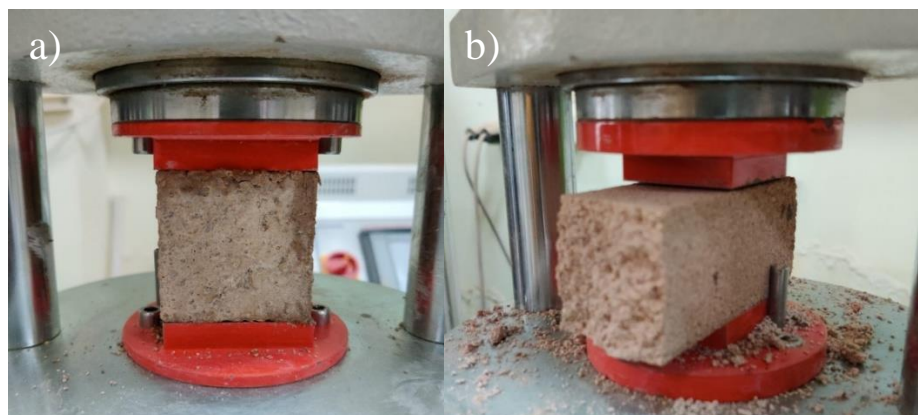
Compressive strength test demonstration, a) cube specimen, b) beam specimen
